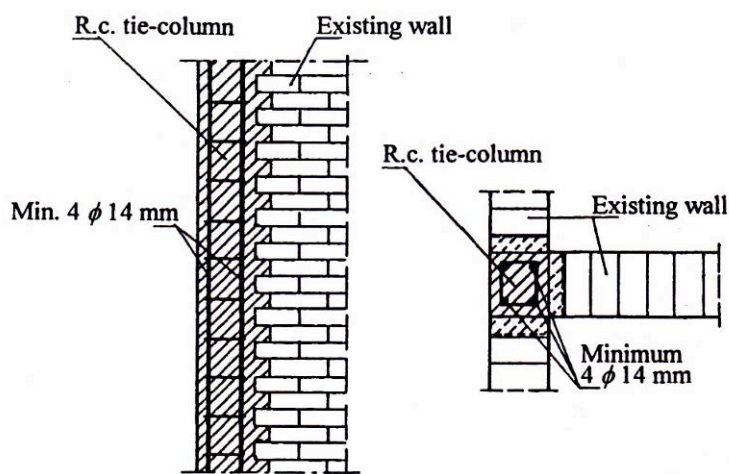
Placement of new tie-columns in a brick-masonry wall [21]
